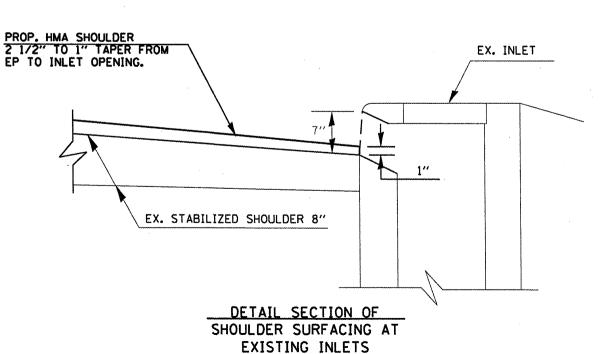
DETAILS FOR HOT-MIX ASPHALT CURB AND SHOULDER REPAIR
